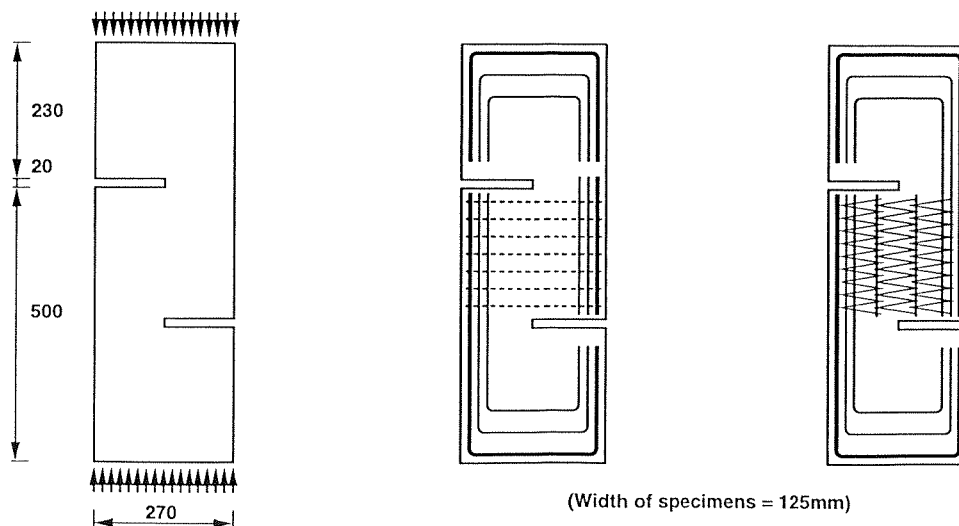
(a) Shear test specimens; (b) Steel and GFRP stirrup positions; (c) AFRP helix positions.
